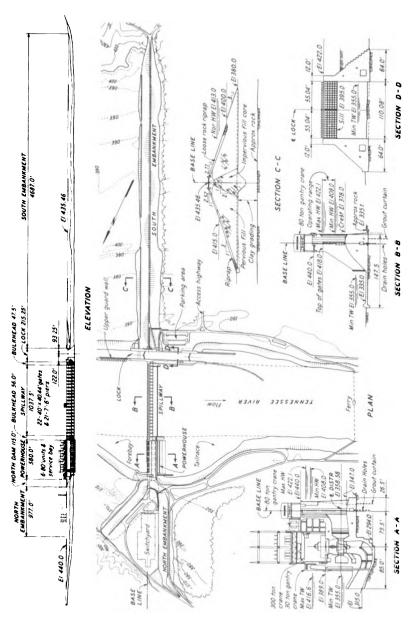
Pickwick Landing—plan, elevation, and sections.
